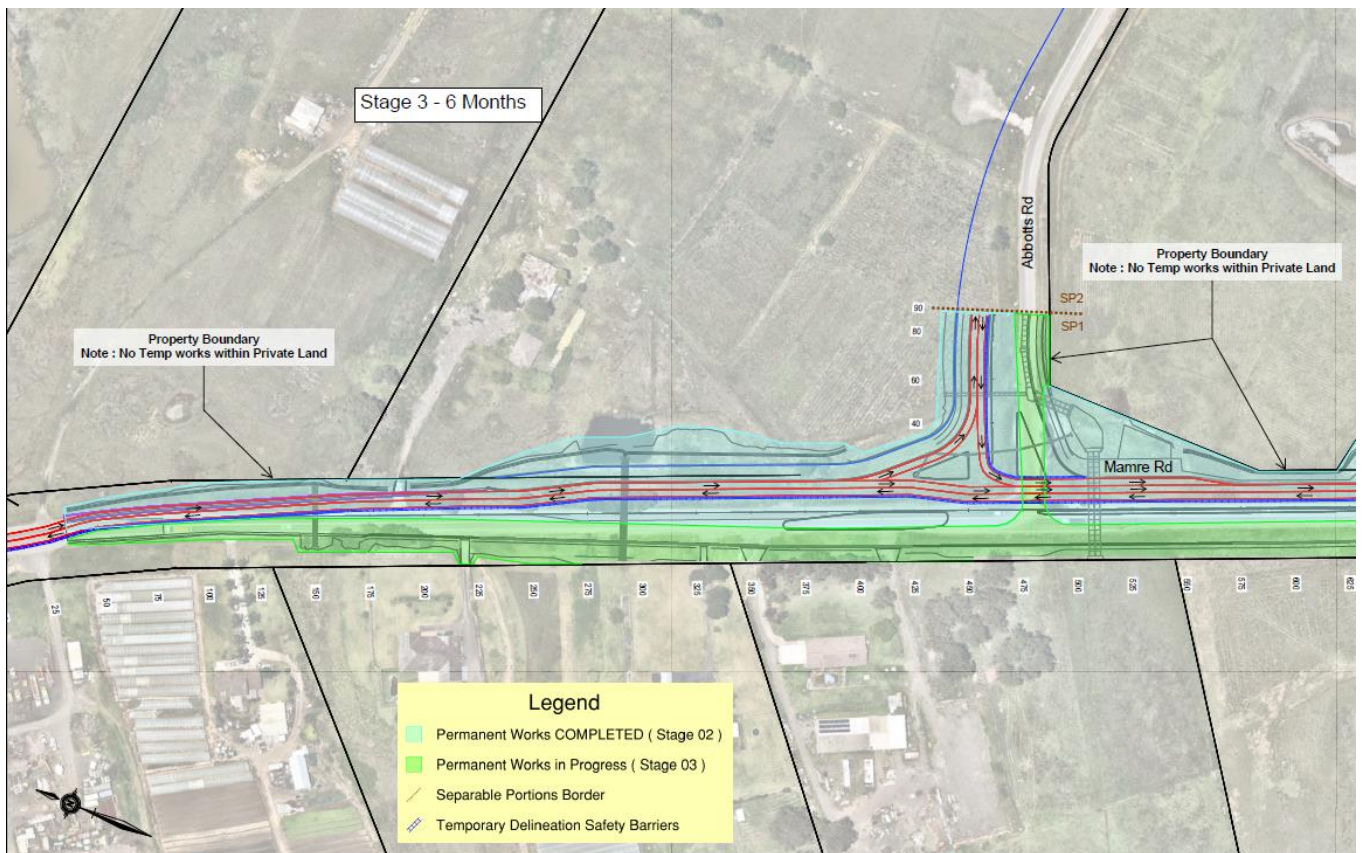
Mamre Road/ Abbotts Road Upgrade Layout- Construction Stage 3
